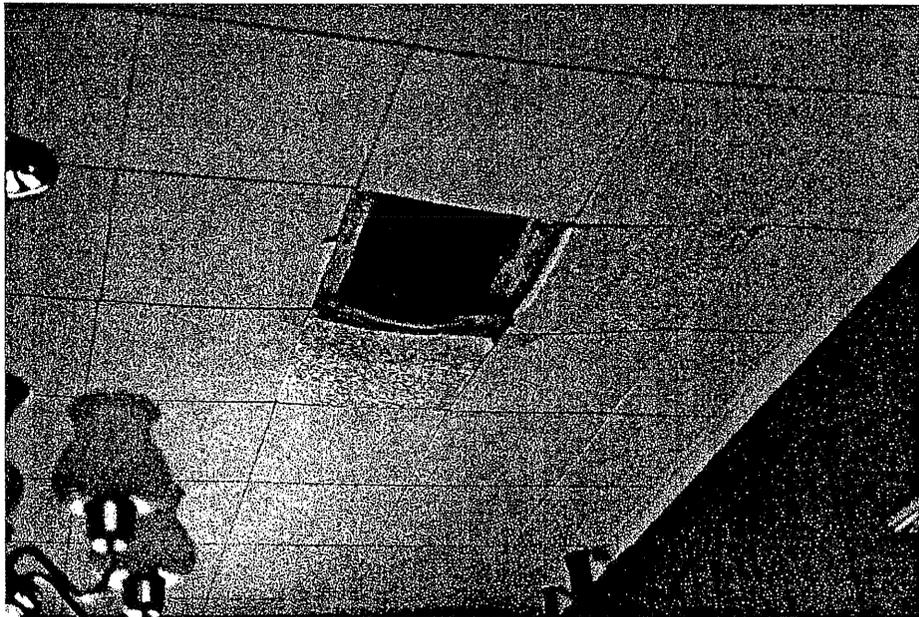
Ceiling damage caused by endemic ongoing plumbing leaks.
